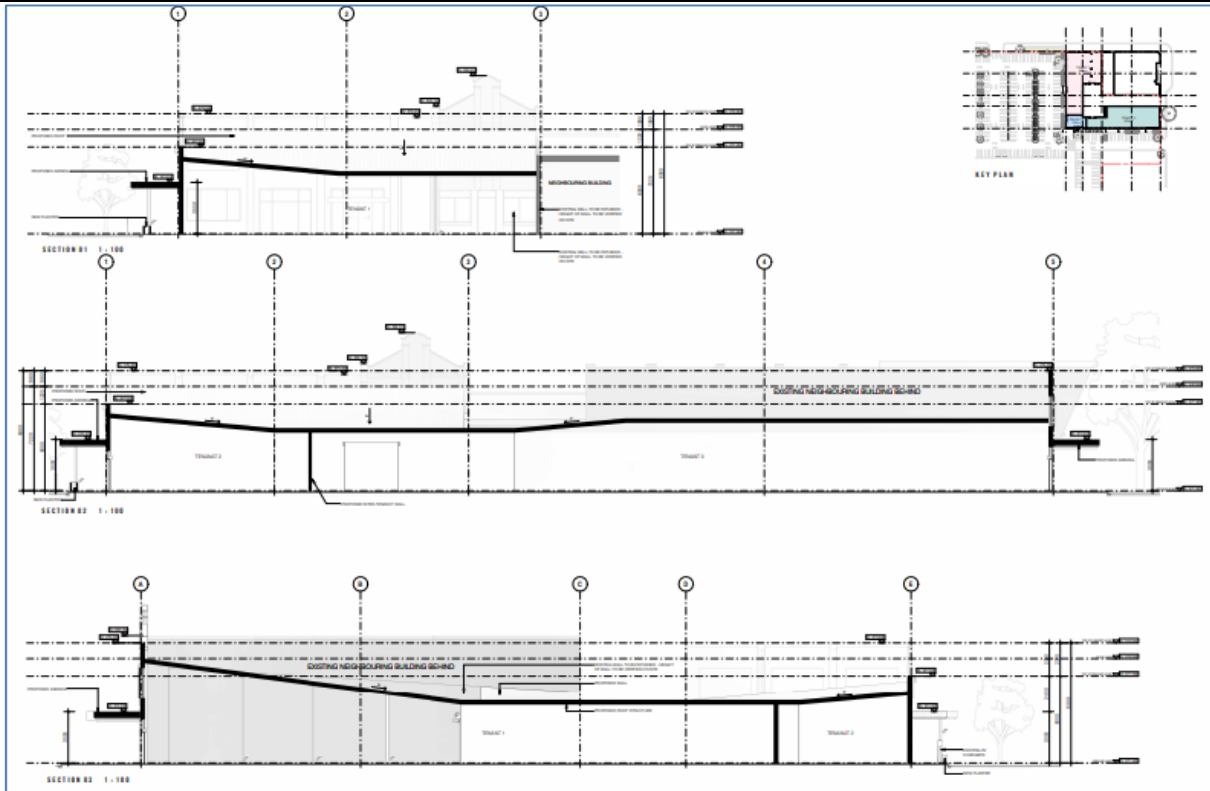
proposed Sections 1-3 (dwg DA34 [R04])
